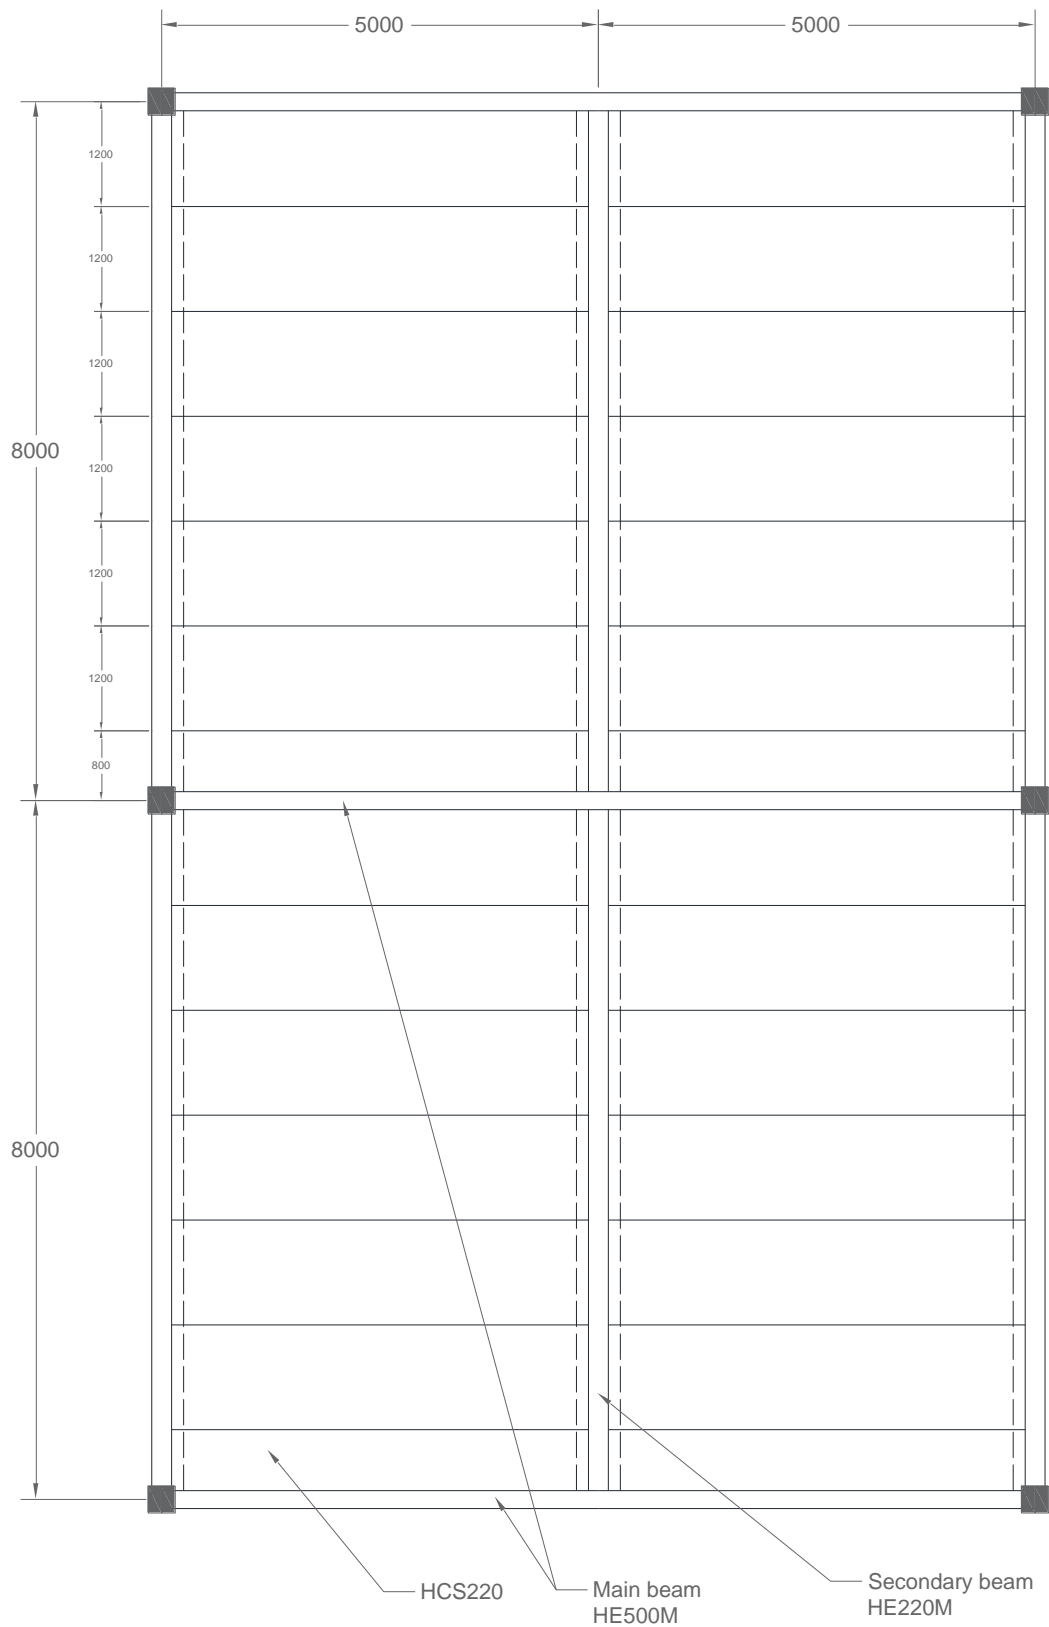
Typical floor with slim floor beams and hollow-core slabs (example 2)
